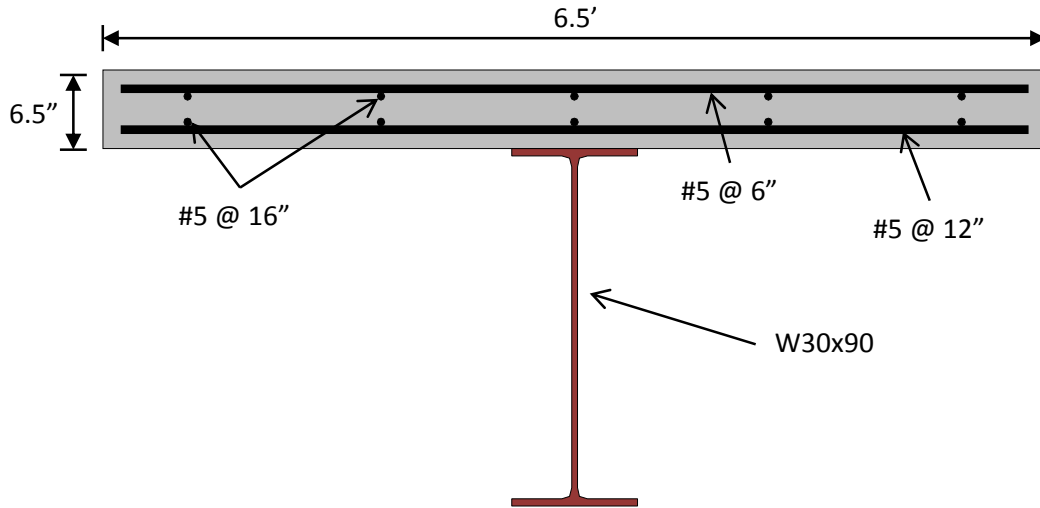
Cross Section View of Large-Scale Test Specimens
